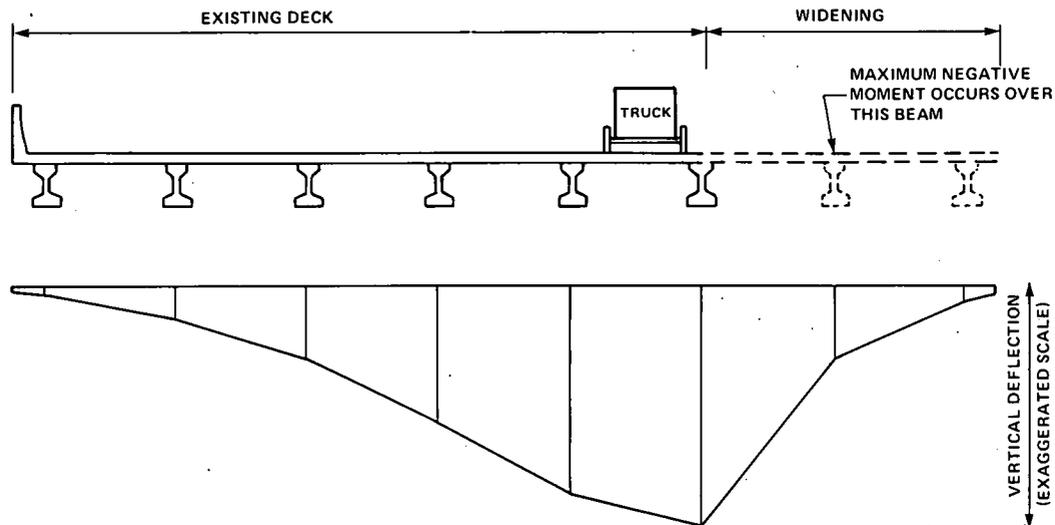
Deflection profile at a transverse section of a bridge at mid-span.
